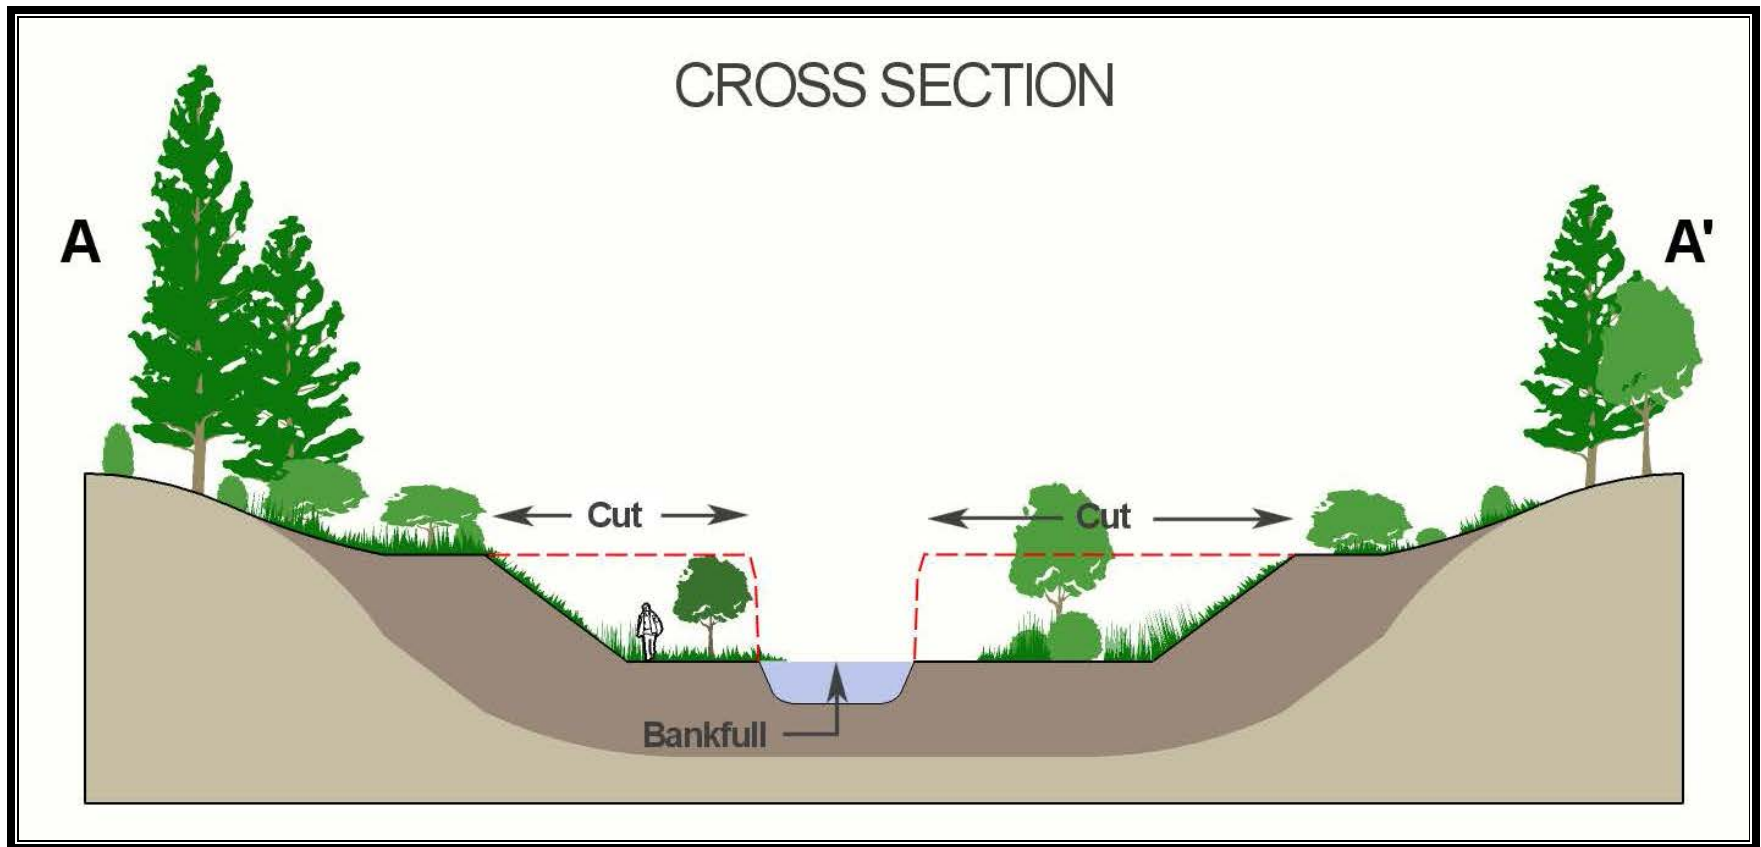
P3-FLOODPLAIN BENCH APPROACH-CROSS SECTION VIEW
